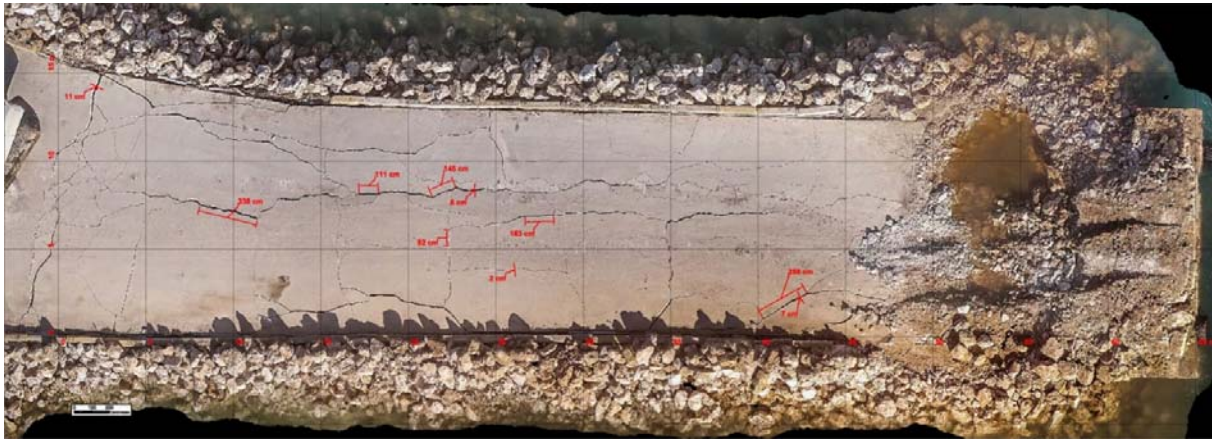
Orthophoto of the damaged port pier in the town of Vasiliki in Lefkada island.
